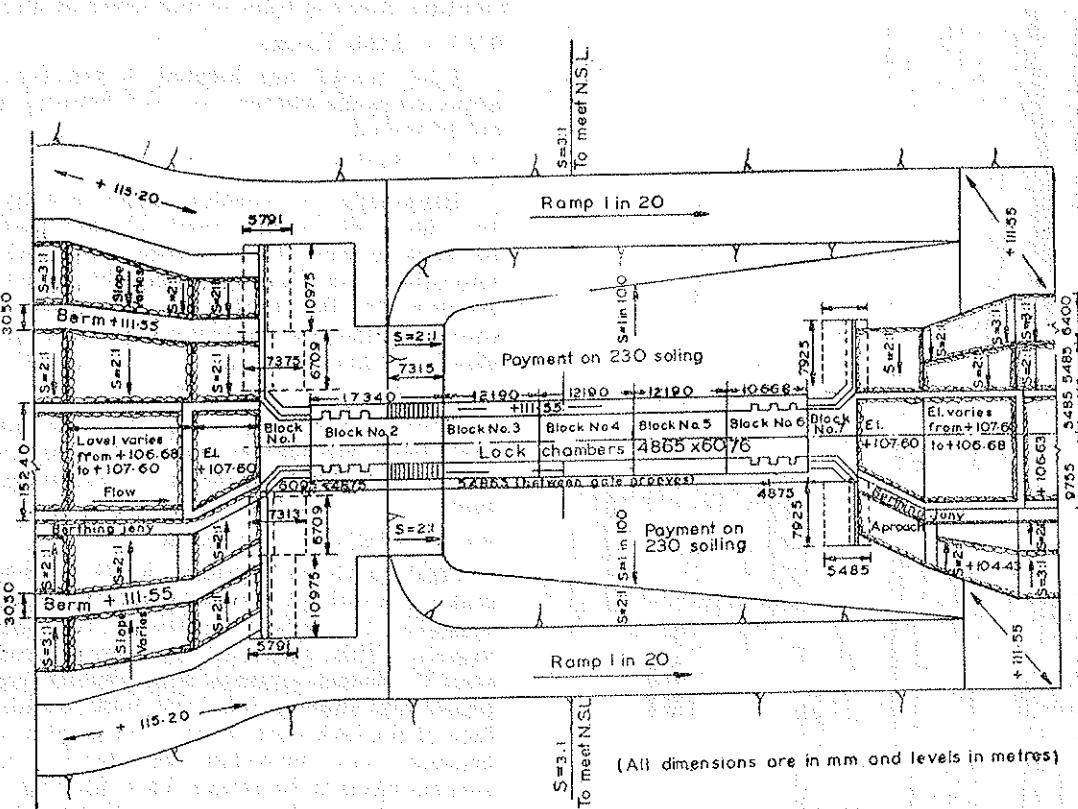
Typical Detailed Plan of Navigation Lock.
